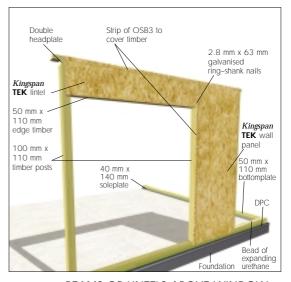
BEAMS OR LINTELS ABOVE WINDOW AND DOOR OPENINGS
